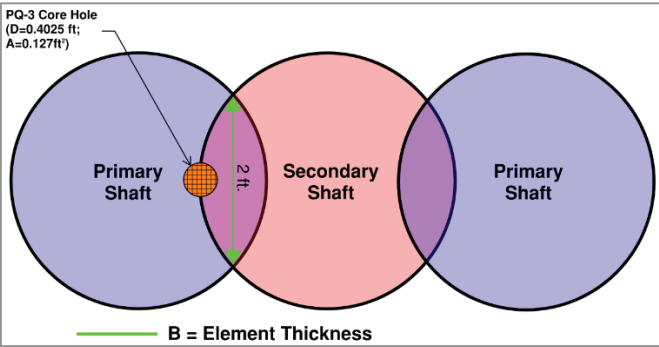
Effective Wall Thickness, B, for Falling Head Permeability Test Example
